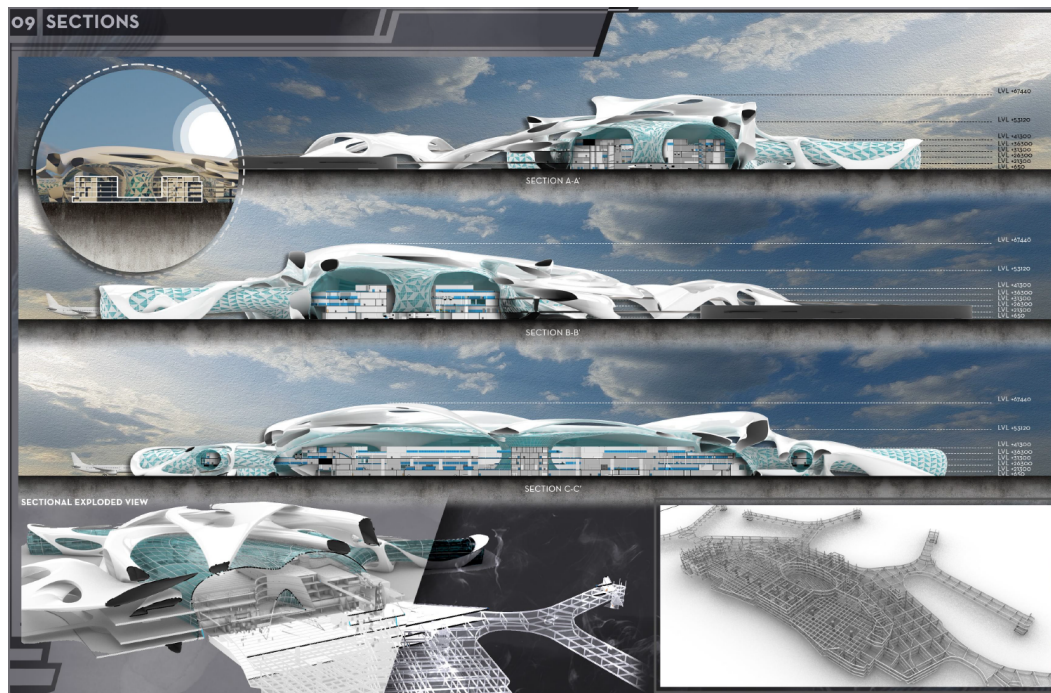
Detailed sections and structural design details. Source: Authors' Work
